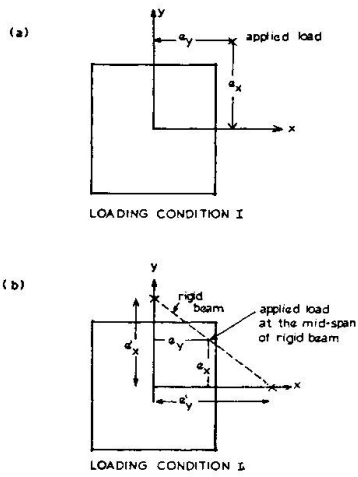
LOADING CONDITIONS FOR BIAXIALLY LOADED SHORT COLUMN
